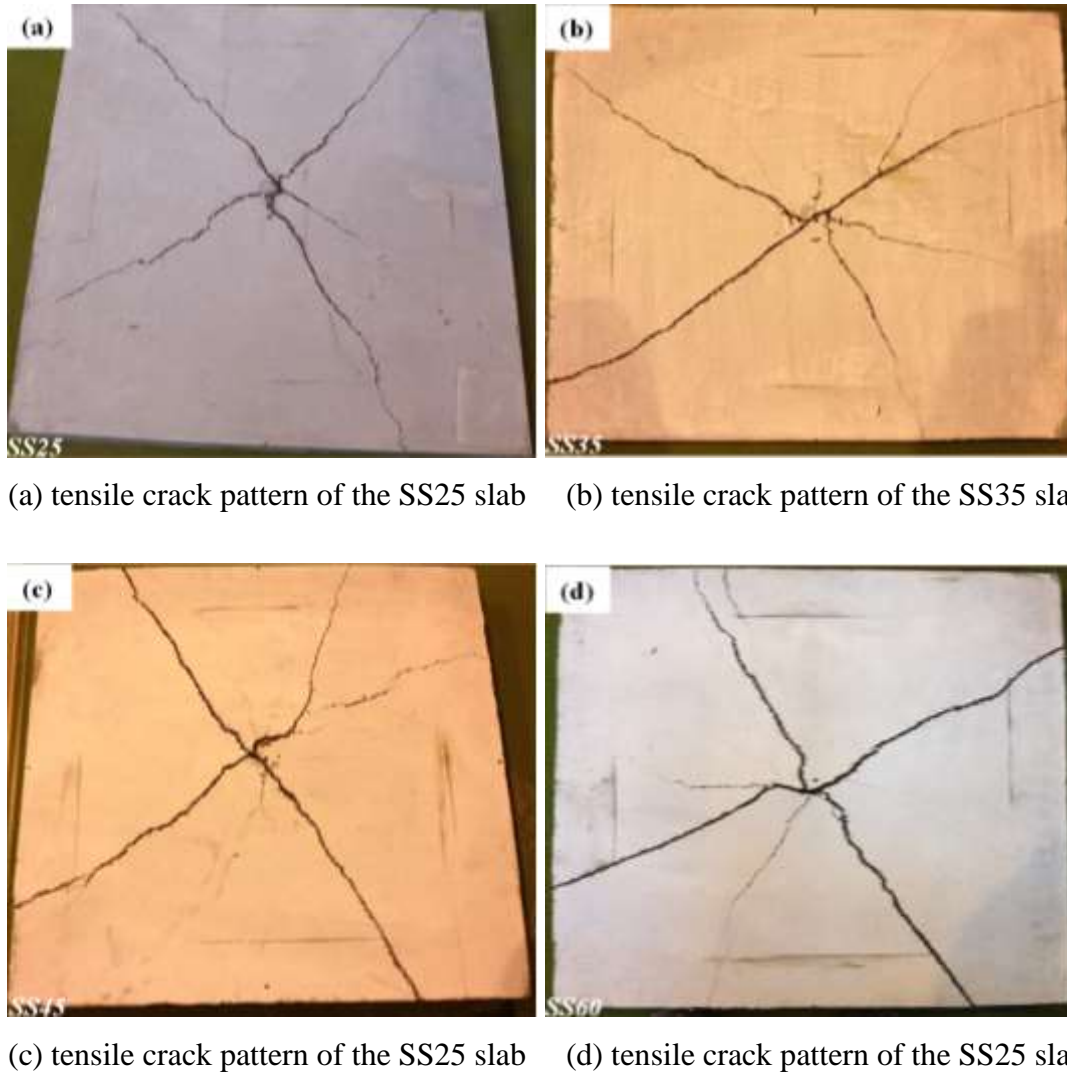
Cracks on tensile face for two-way slabs with SS boundary condition.
